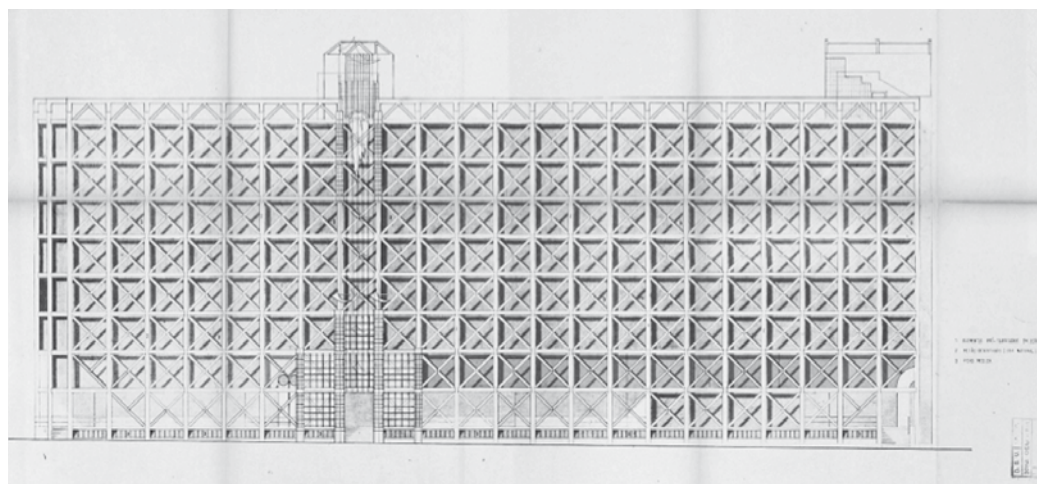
West elevation of the building, 1983. Source: NO. 60497 Proc 4348-DMPGU-OB-1983 – Page 14. Lisbon, 1983 [Lisbon Municipal Archive]
